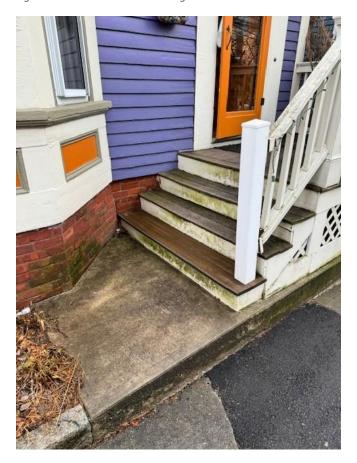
20 Fairmont Ave, Existing concrete step to be removed
